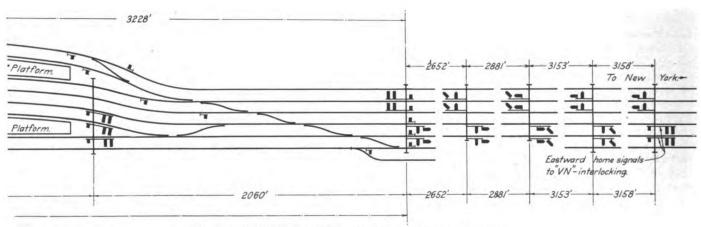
Track Plan and Signal Location at North Philadelphia.
